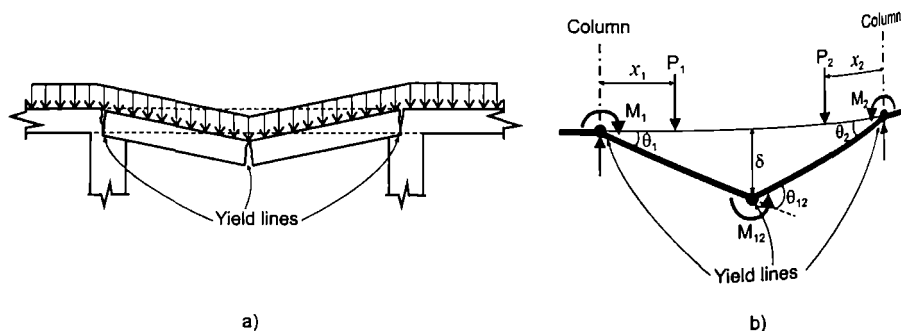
Plastic mechanism in a two-way slab: a) actual slab span, showing locations where the reinforcement has yielded and the plastic rotations have occurred, and b) a slab model.
